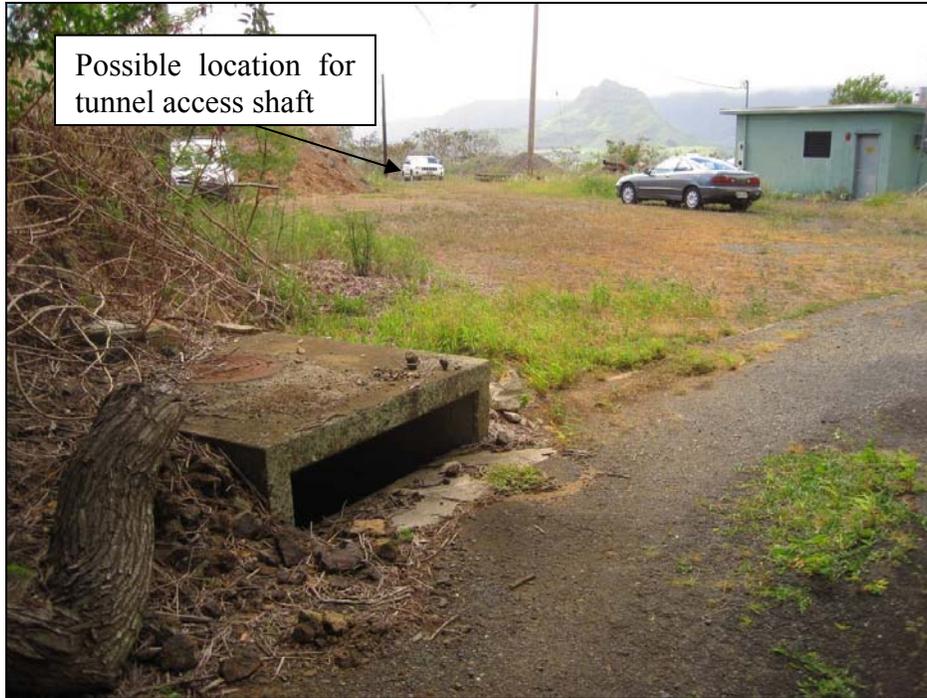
Flat, undeveloped area just east of water tank, BWS property at Mōkapu Saddle Road, view to southeast
